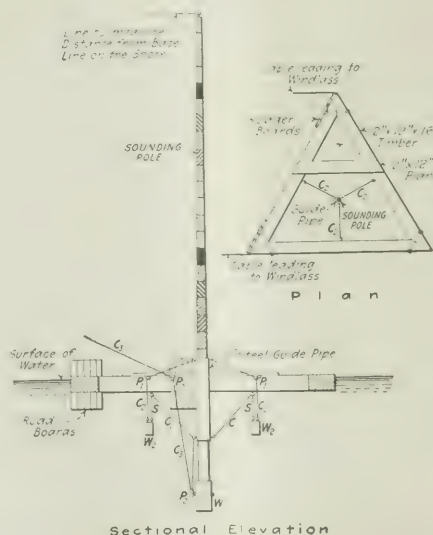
PLAN AND SECTIONAL ELEVATION OF FLOAT
